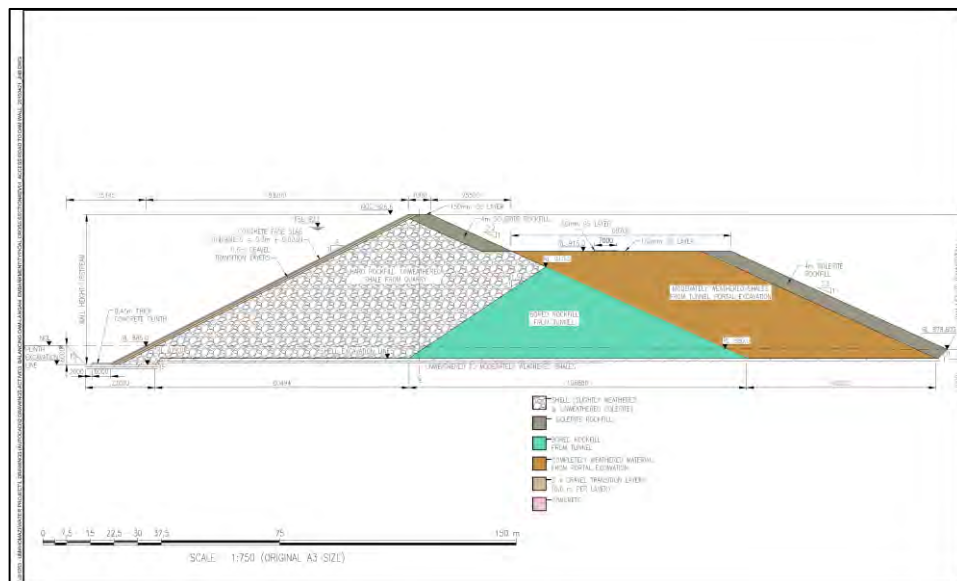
Cross Section of the CFRD Embankment at Langa Dam with a Dolerite Downstream Protection Layer Dam
